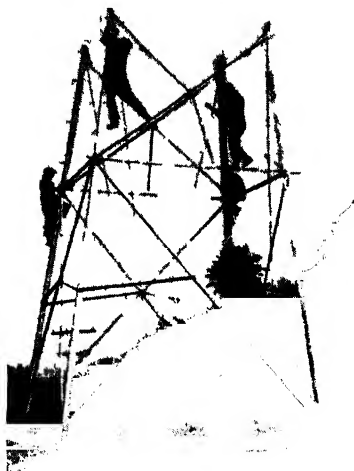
Bolting struts in position on top part of lower section (Courtesy Central Illinois Light Co)
